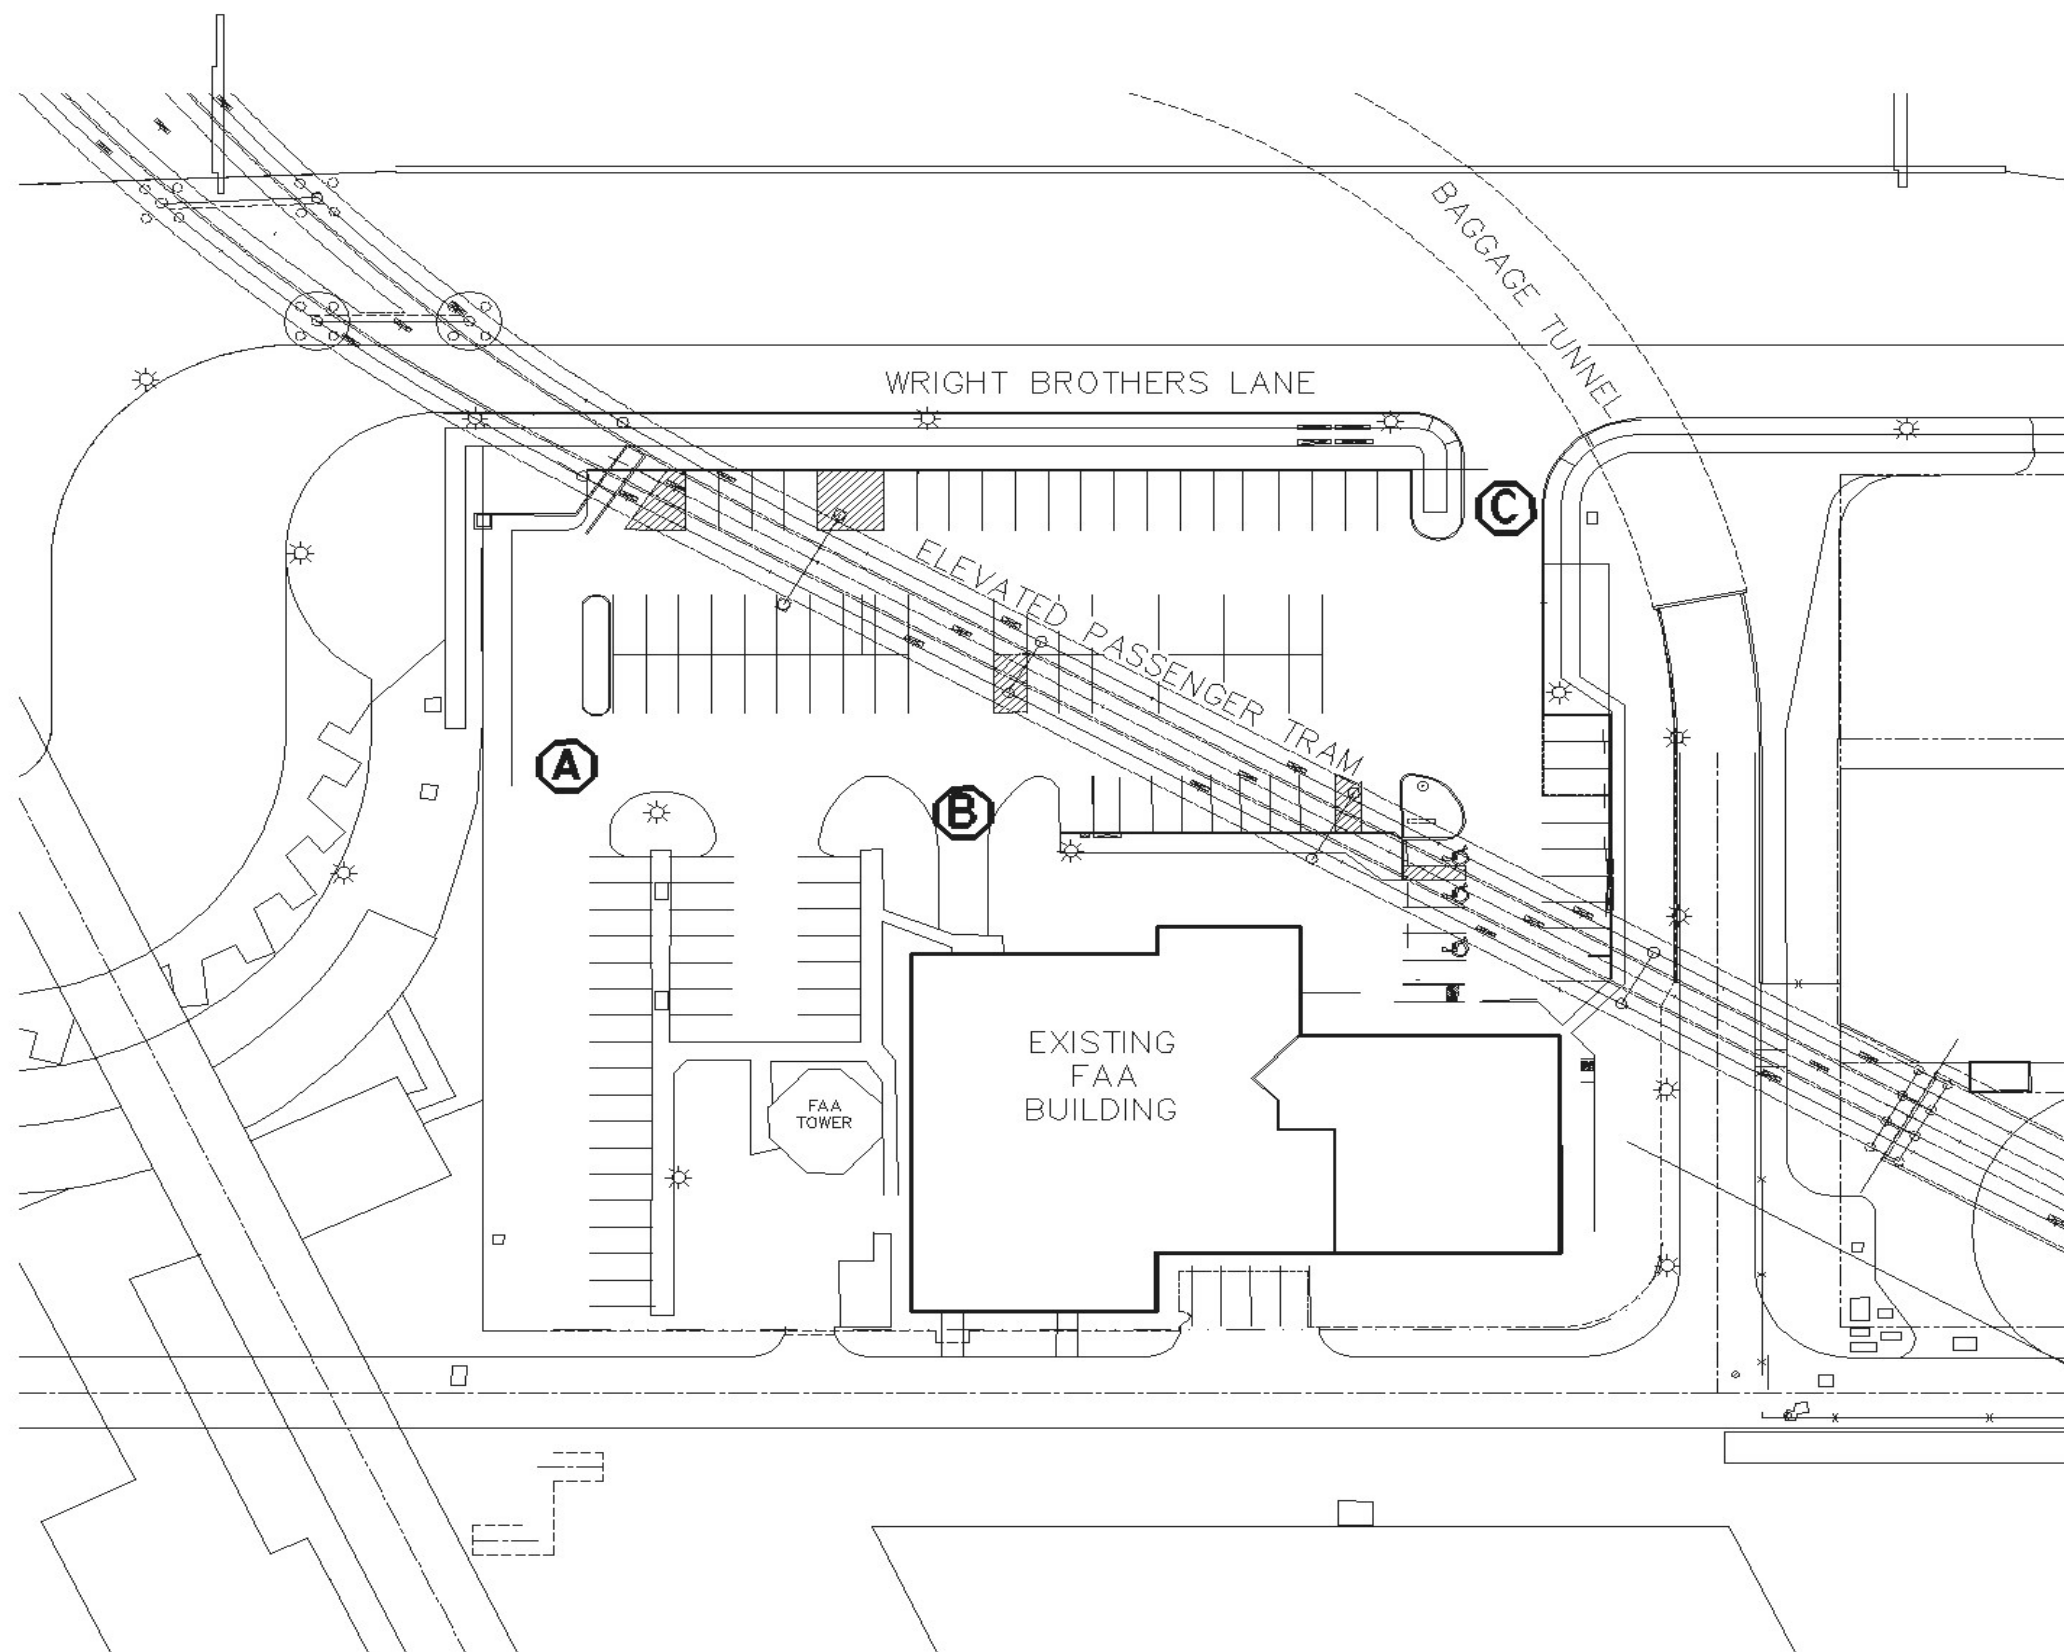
Existing ATCT Site Showing Locations of Sites A, B, and C
